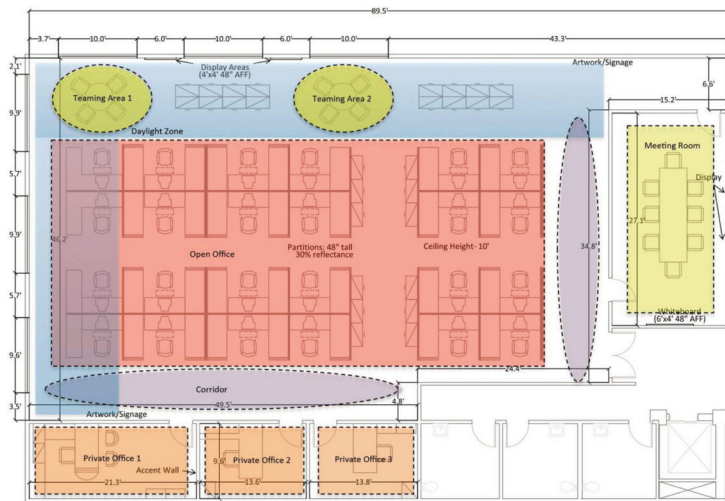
Floor plan of office application used for the DOE funding opportunity.
